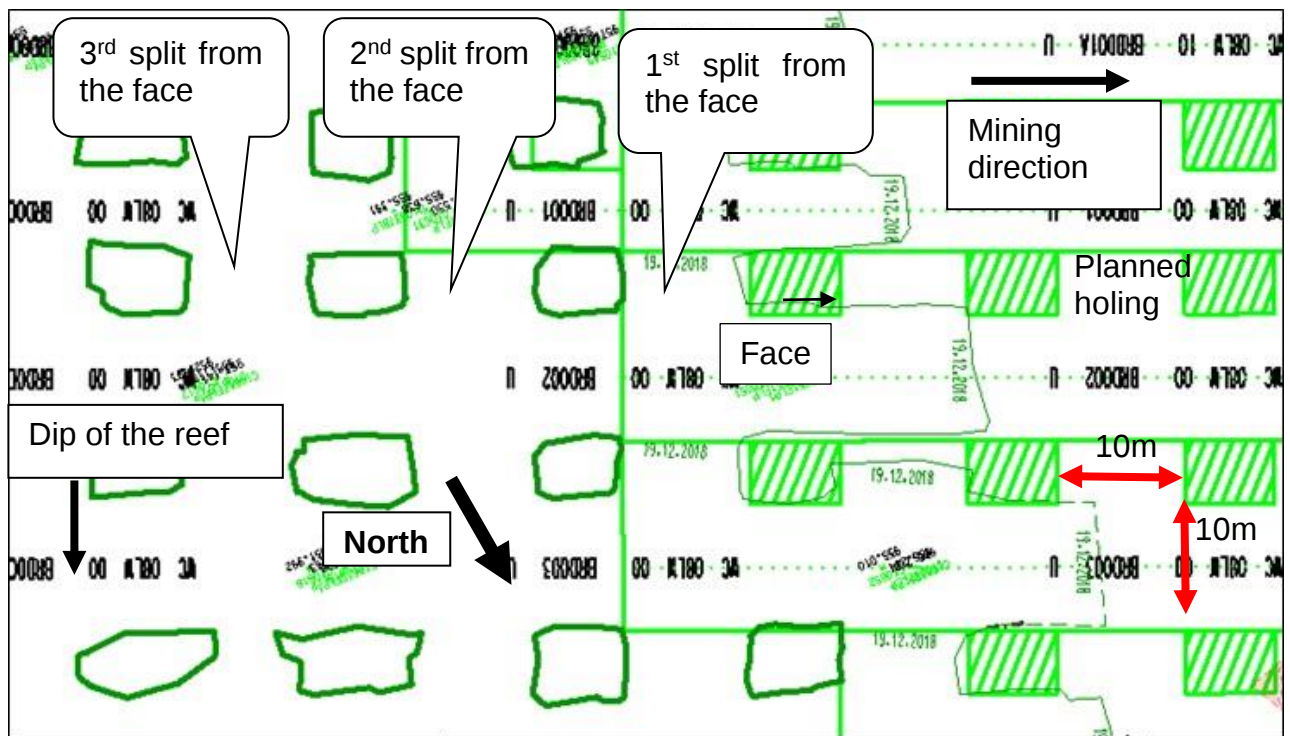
Plan view of typical layout at Bathopele - not to scale
